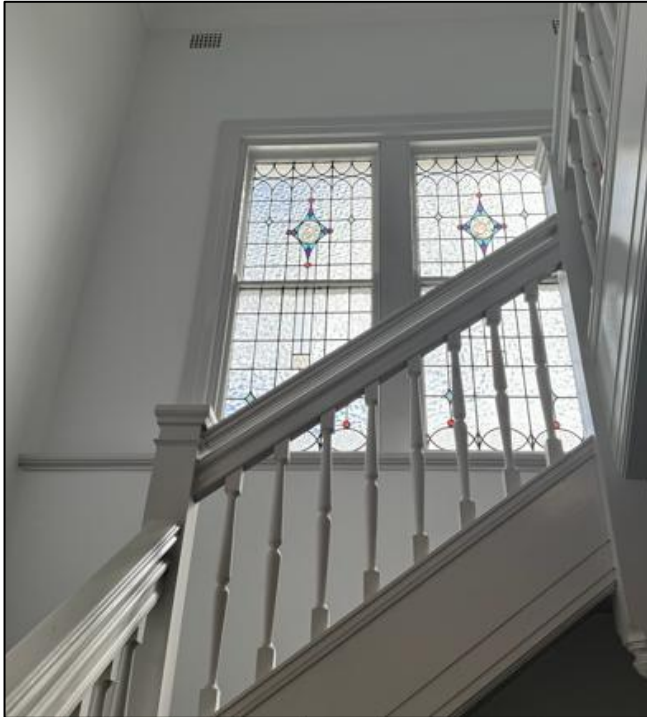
View of contemporary staircase and balustrade, alongside non-original windows with leadlight glazing.
